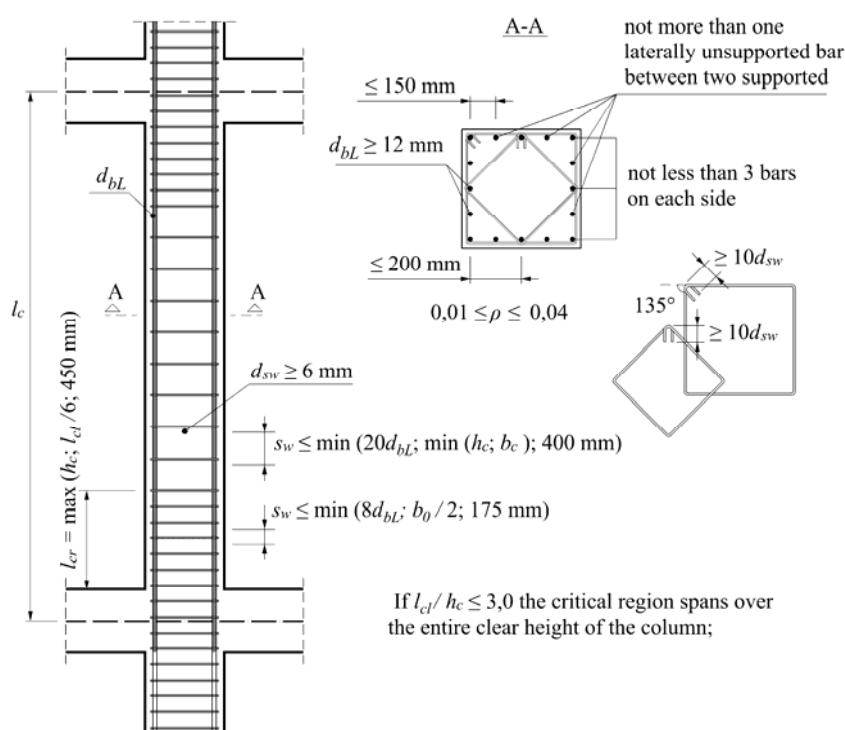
Reinforcement detailing requirements for columns in seismic MRF – DCM
